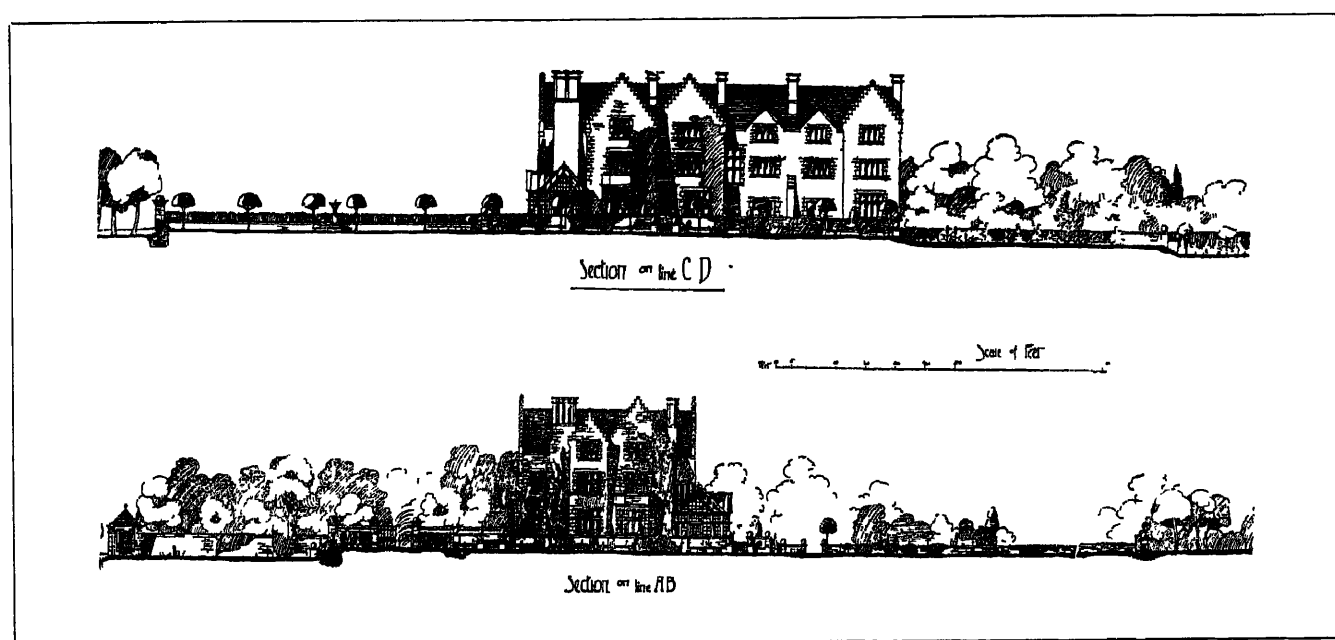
SECTIONS THROUGH GROUNDS AT LITTLE ONN HALL.
